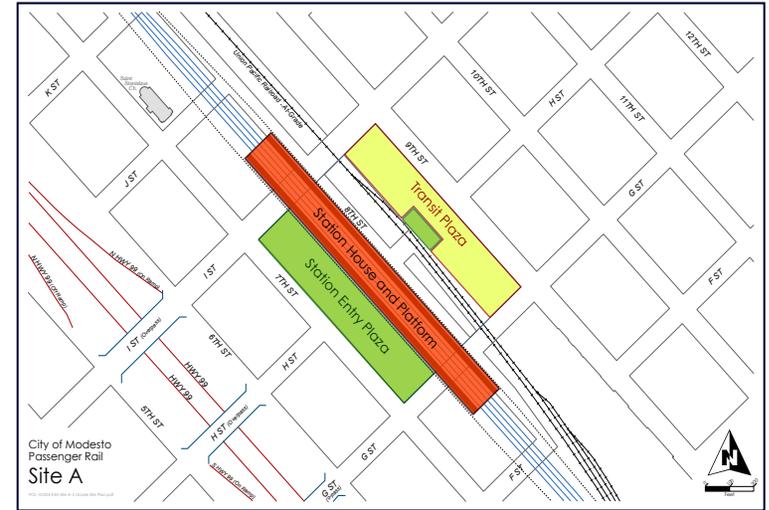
Conceptual Site Plan, At-Grade Passenger Rail Service
